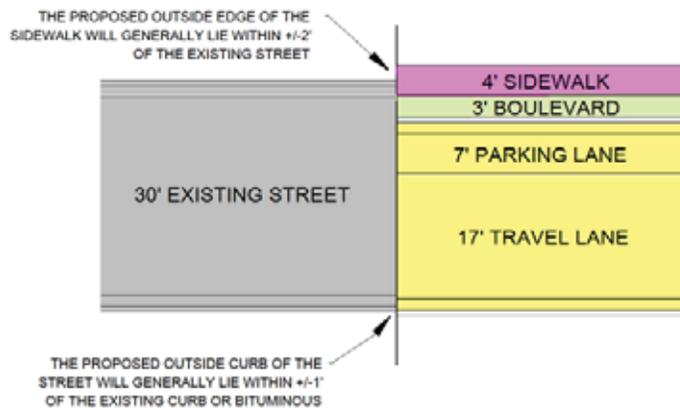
Proposed Street Section for Arden Avenue and West 52<sup>nd</sup> Street
